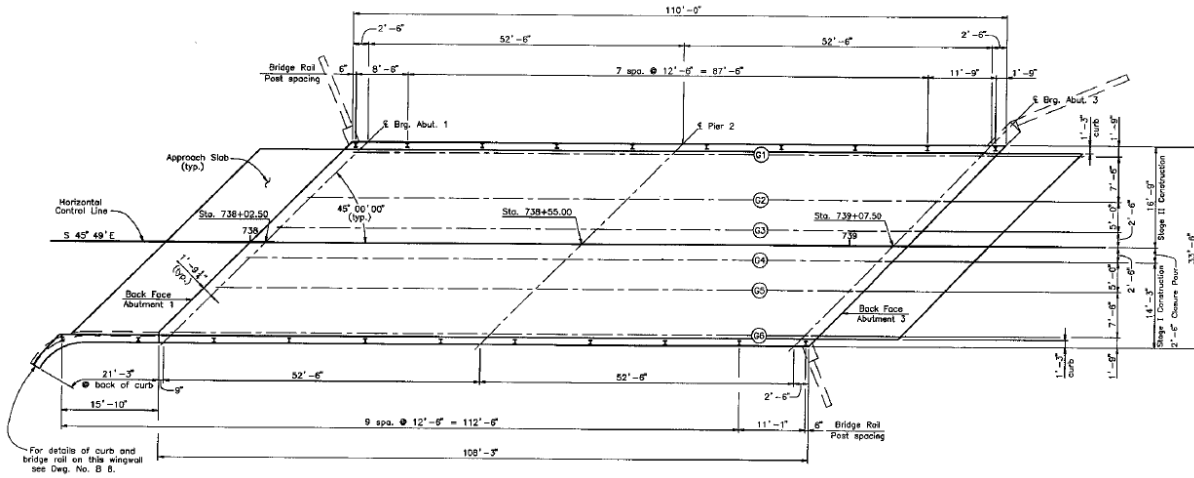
Plan view of the bridge deck of C-15- C (CDOT see Appendix A)
